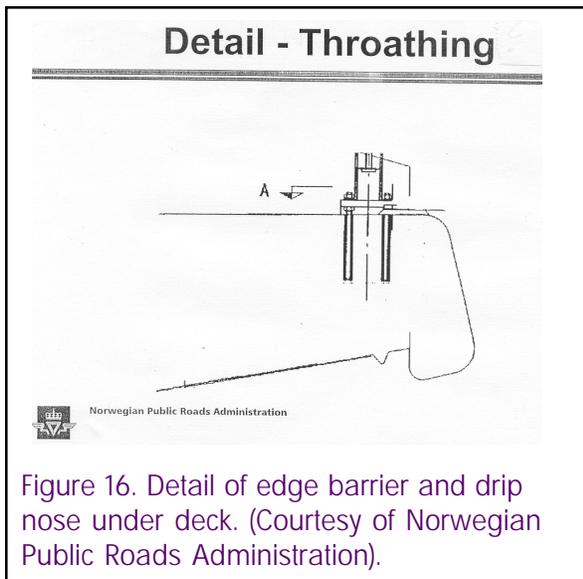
Detail of edge barrier and drip nose under deck. (Courtesy of Norwegian Public Roads Administration).
